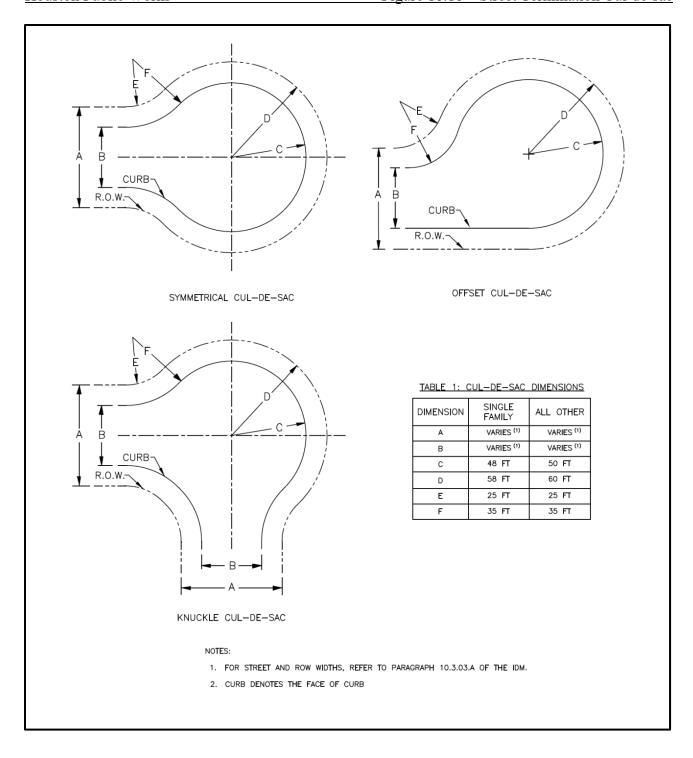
STREET TERMINATION CUL-DE-SAC
